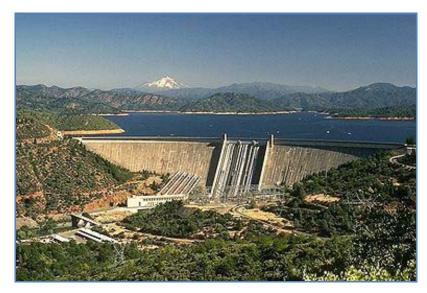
One of the first big water storage projects in the west. Shasta Dam blocks the Sacramento, McCloud, and Pit Rivers. Shasta Dam overlooks, CA (1983).
